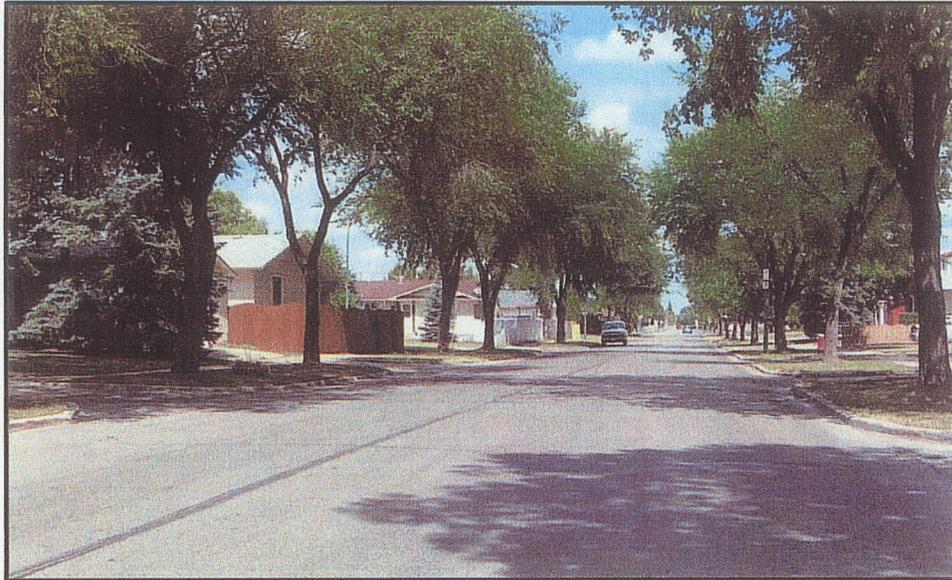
Typical Rural Cross-Section of Betsworth Avenue, facing West
